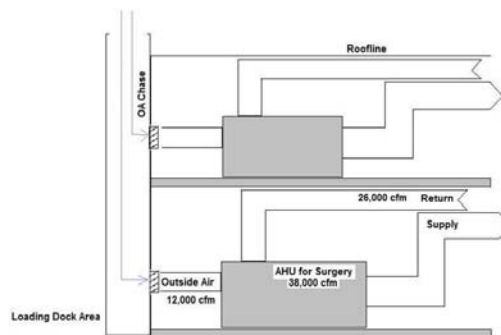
Elevation Schematic of Existing Stacked Mechanical Rooms
